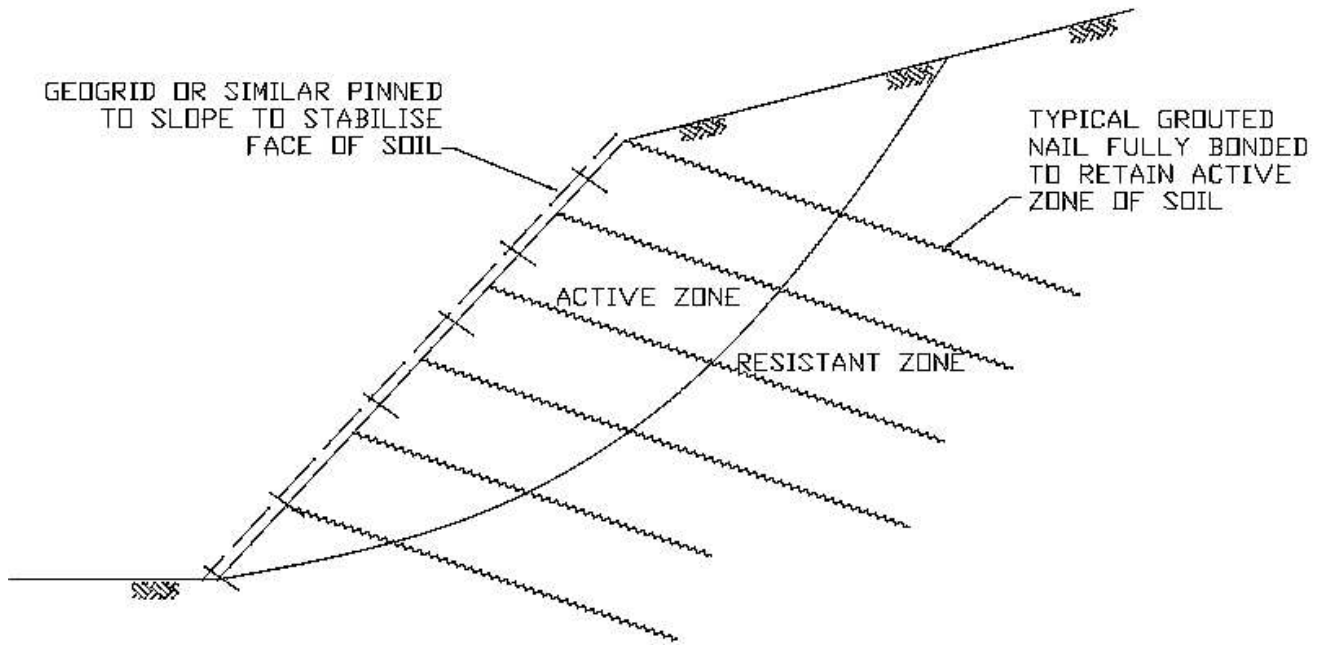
Shallow slope stabilisation with soil nails used to retain the active zone of soil.
